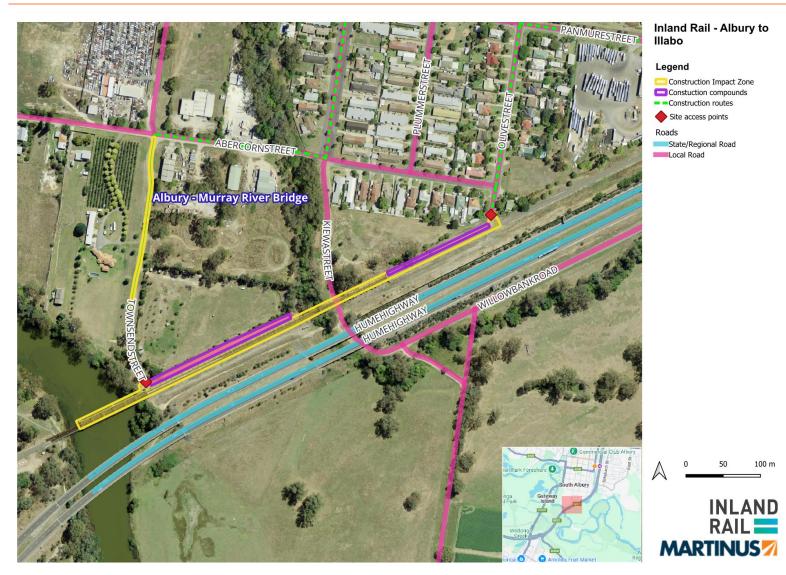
MURRAY RIVER BRIDGE CONSTRUCTION ROUTES
